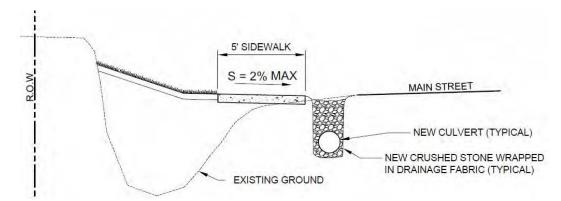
Sidewalk Cross Section Northeast of Athens Drive
